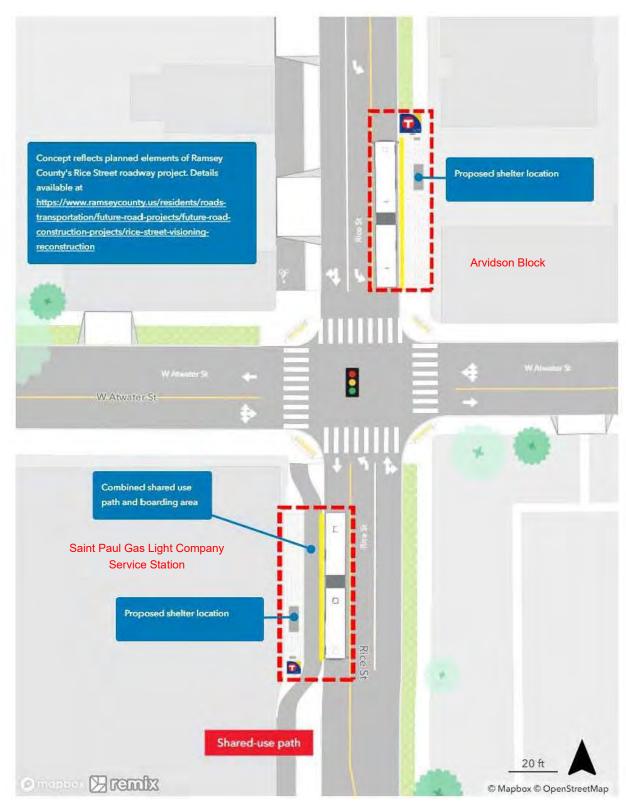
Rice Street North and Atwater Street Station Concept Plan in area of the Arvidson Block.
